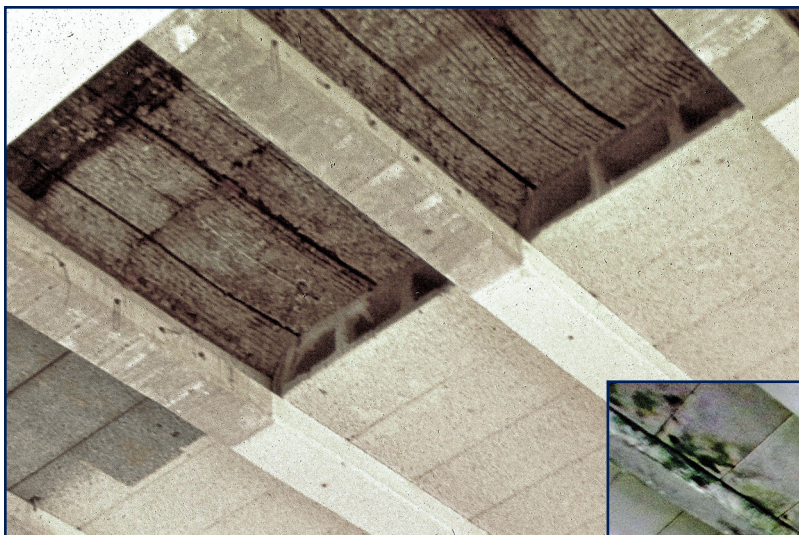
New openings or repairs can be a challenge for F & A roof decks.
